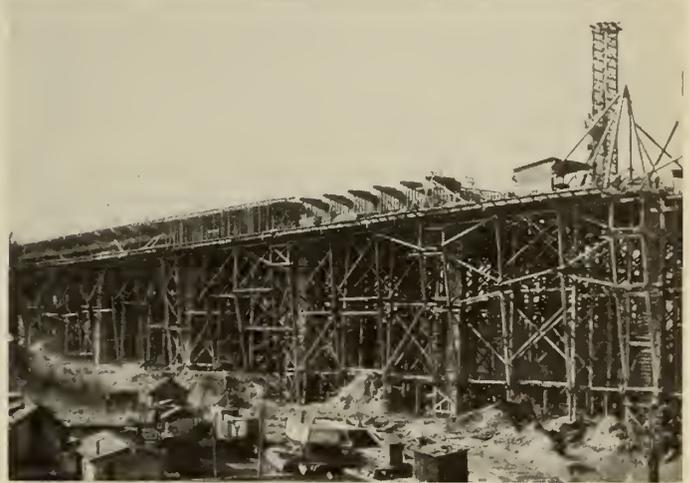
Falsework for Viaduct—Bent 16 to Pier 1.
